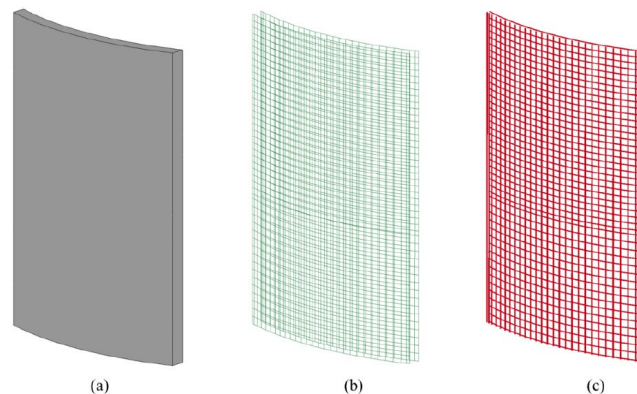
Finite element model of the pontoon wall portion, (a) concrete, (b) rebar and stirrups, and (c) prestressed tendons [6].
